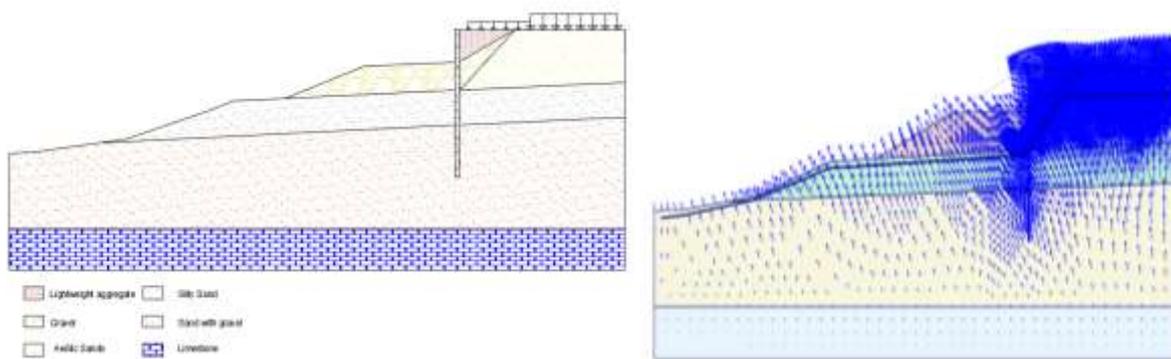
GEOMETRY OF THE PILEWALL AND DEFORMATIONS FOR HIGH GROUND WATER LEVEL
